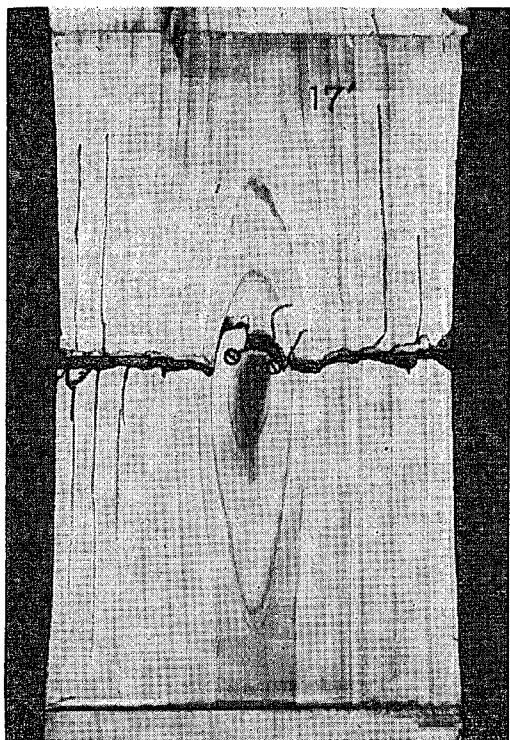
Pith side face of knotty specimen after failure test (Specimen No. 17).
